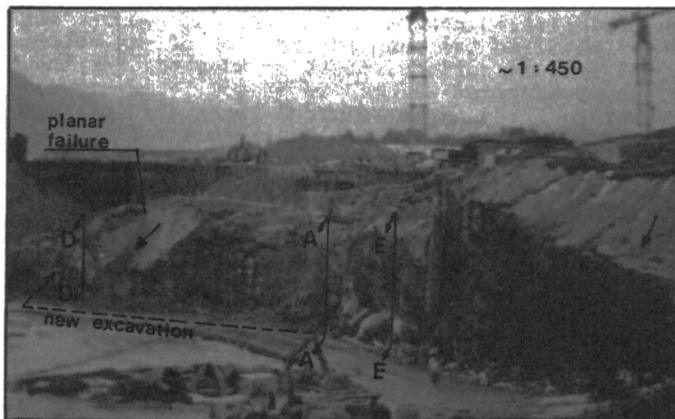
General view of preexisting slope and new excavation (R. H. half).
